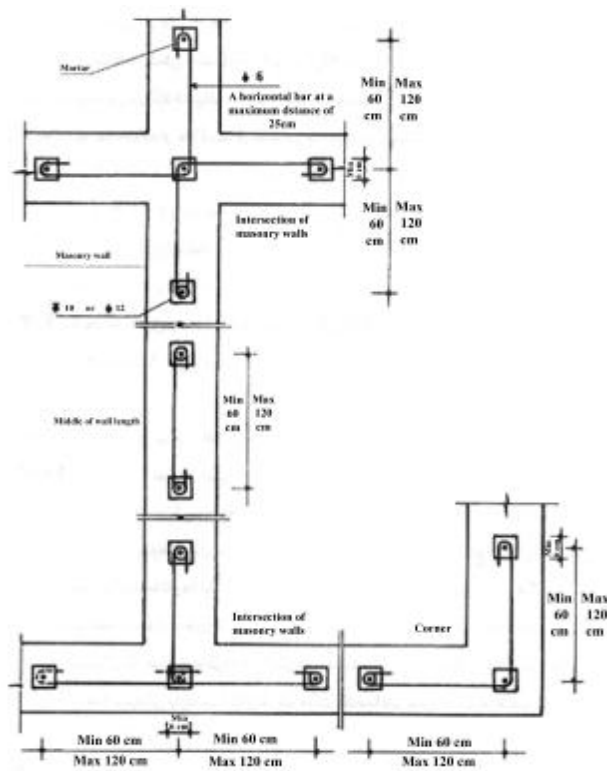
Horizontal and vertical wall reinforcement arrangement details
